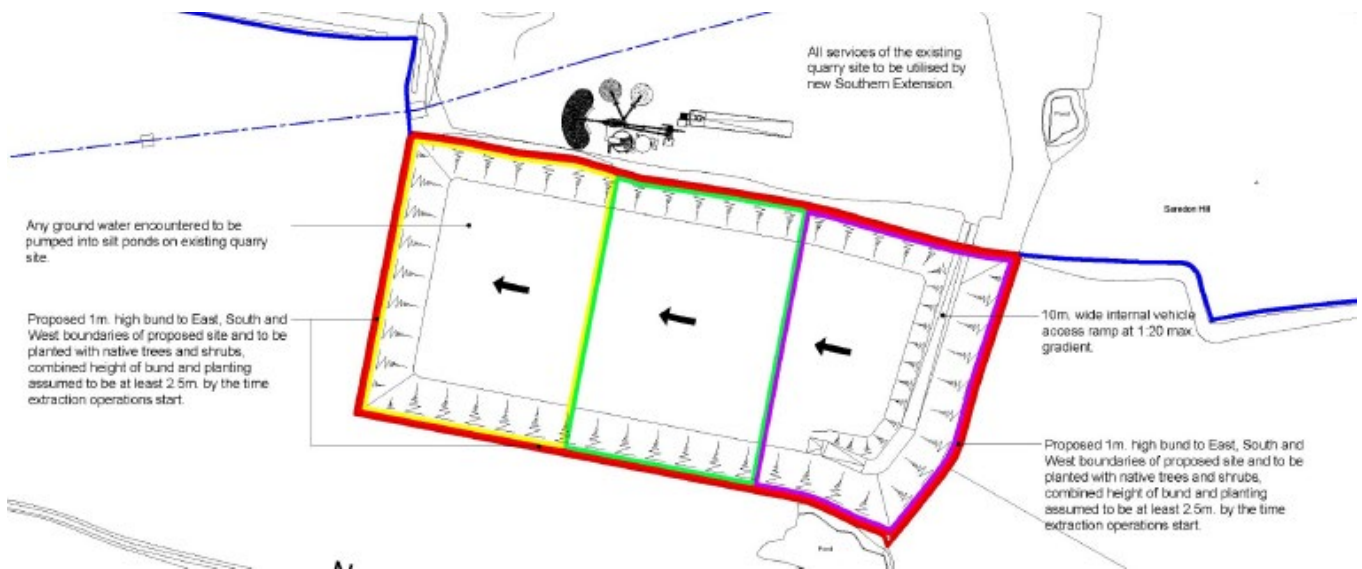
Extract from Plan 2 to this report showing the three extraction phases within the southern extension and access to processing plant.
